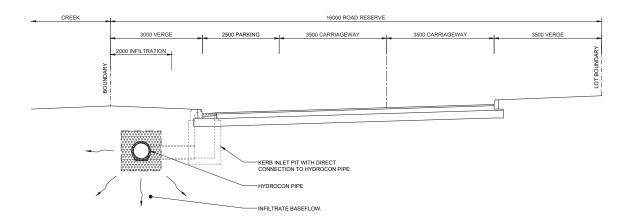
Road Scale Retention Adjacent to Riparian Zone - Typical Section (sub-surface flows into hydrocon pipes) (Source: Craig & Rhodes)
